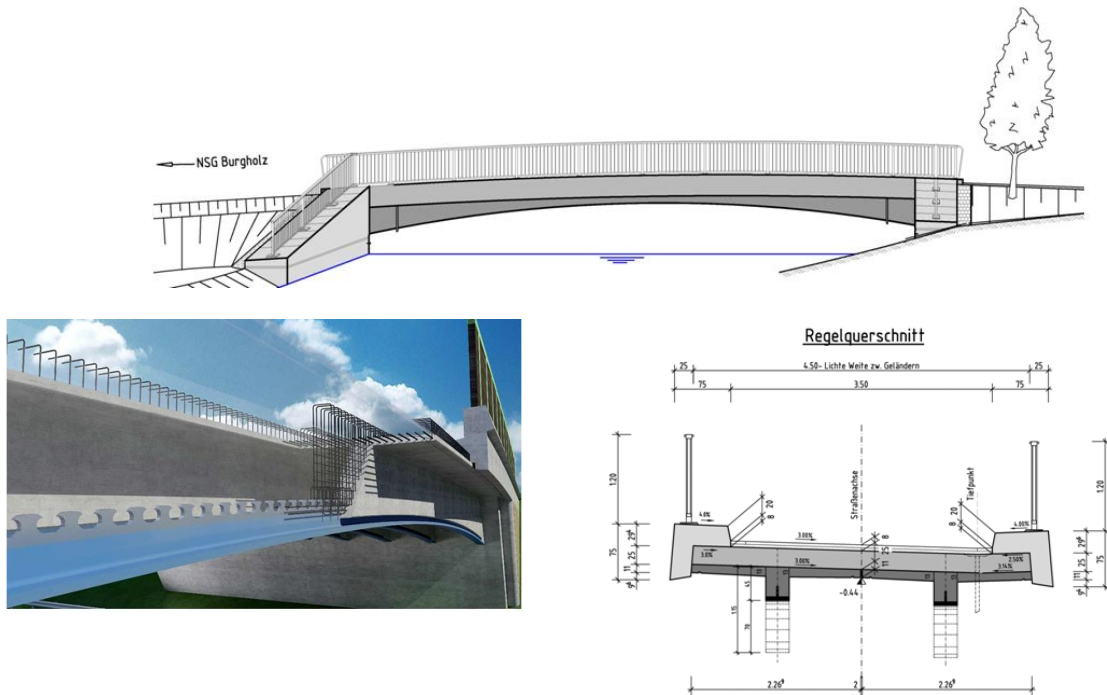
First hot-dip galvanized Precobeam bridge “Elster bridge Halle-Osendorf (D)” (SSF Ingenieure and ArcelorMittal)
